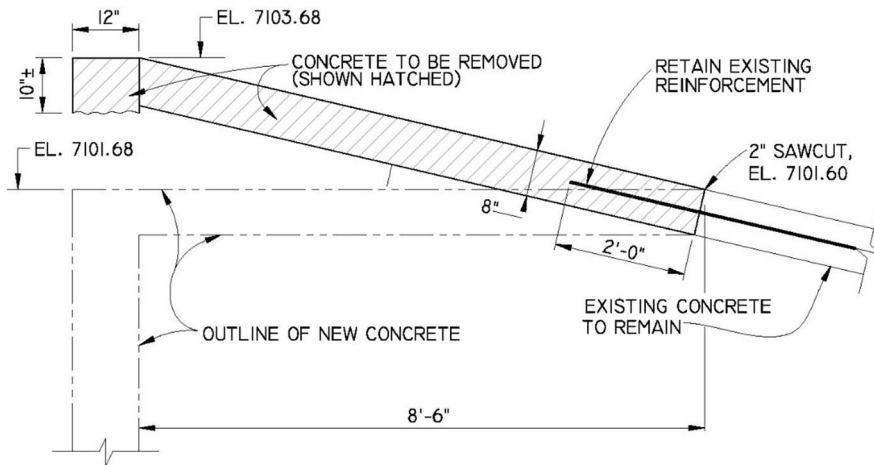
Example of Distinguishing New Work from Existing Facility
